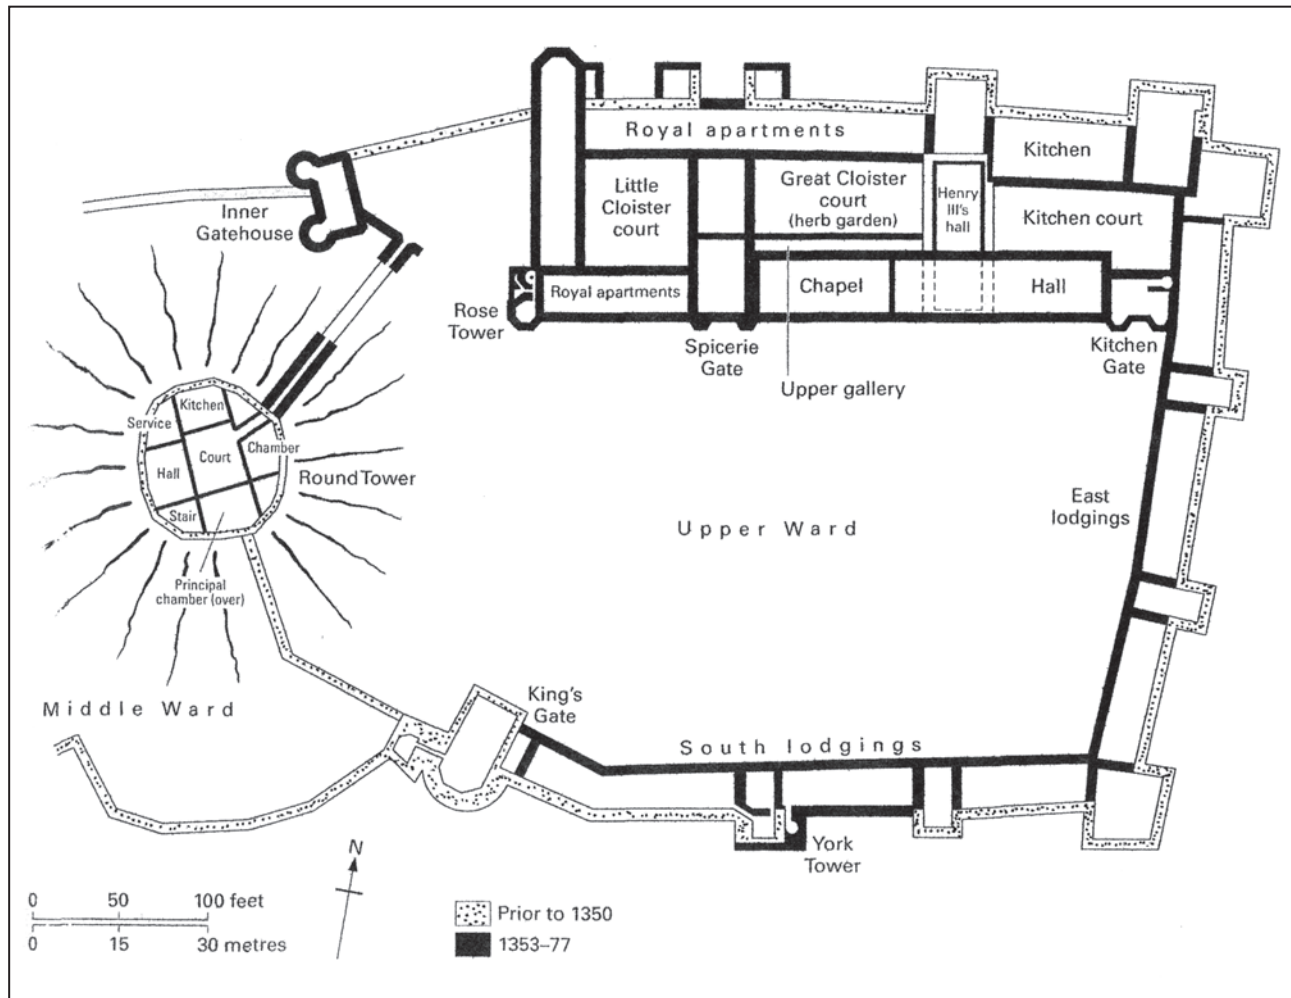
Windsor Castle: site plan of the Round Tower and the Upper Ward
